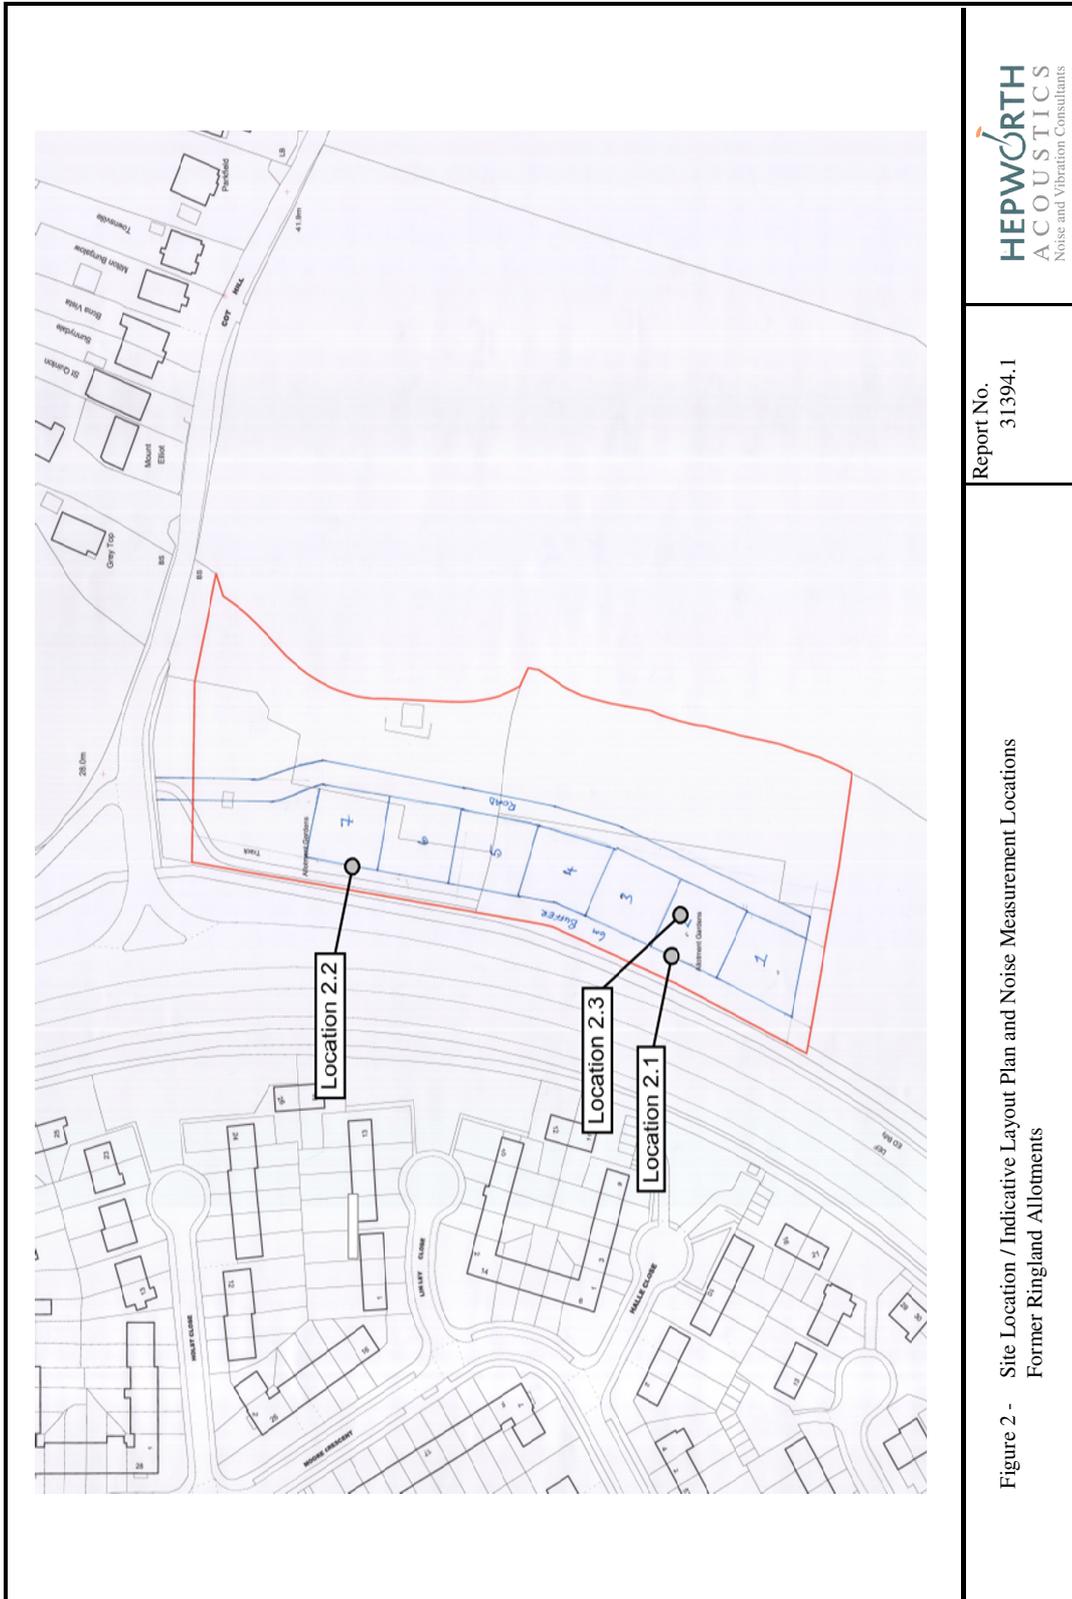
Site Location / Indicative Layout Plan and Noise Measurement Locations
